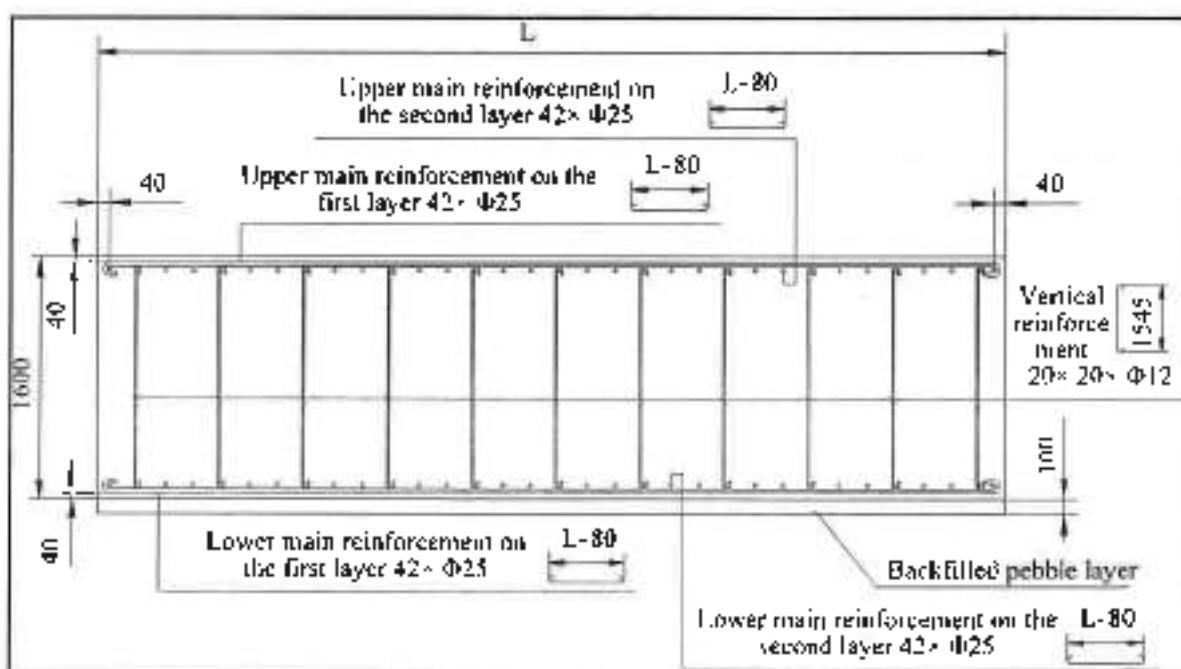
Schematic diagram of reinforcement layout of concrete foundation
